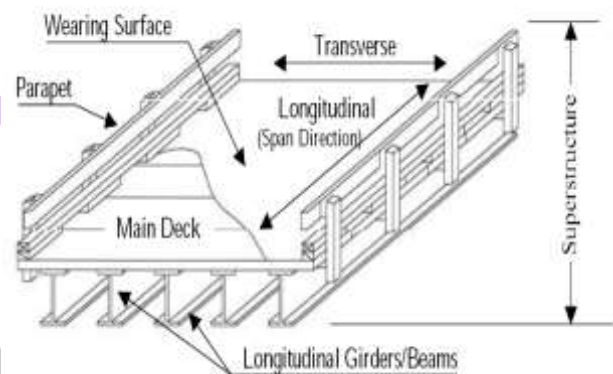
Superstructure of a bridge illustrating bridge engineering terms
